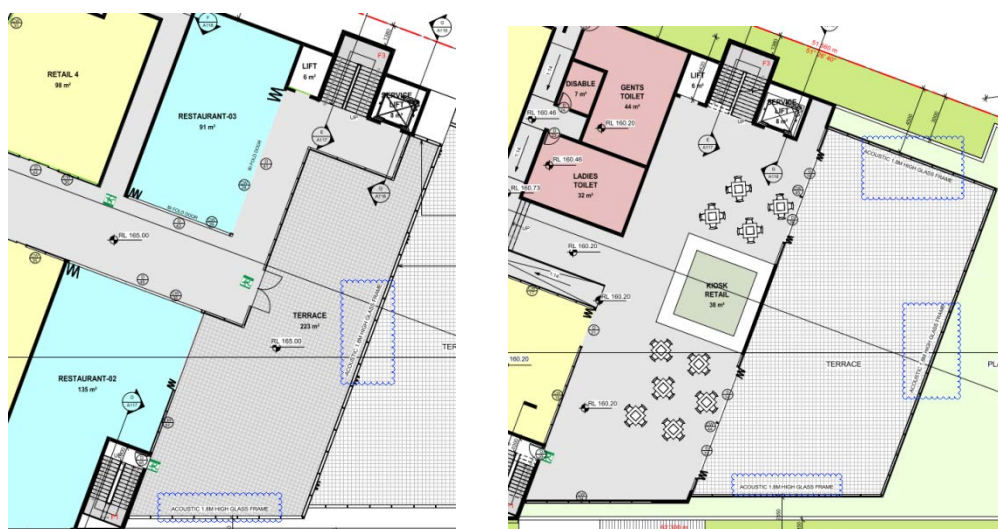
Acoustic wall surrounding outdoor terraced areas (first floor left and ground floor right)
